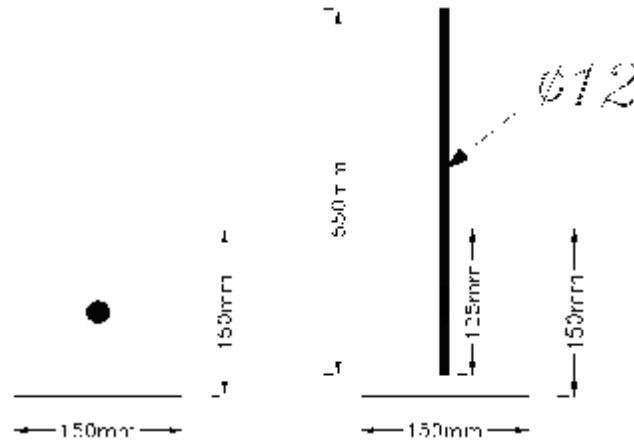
The dimensions of pull out test specimens ,the location and the length of imbedded deformed steel bar in concrete specimens
